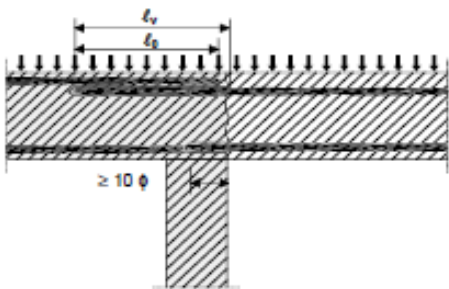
Overlap joint for rebar connections of slabs and beams
